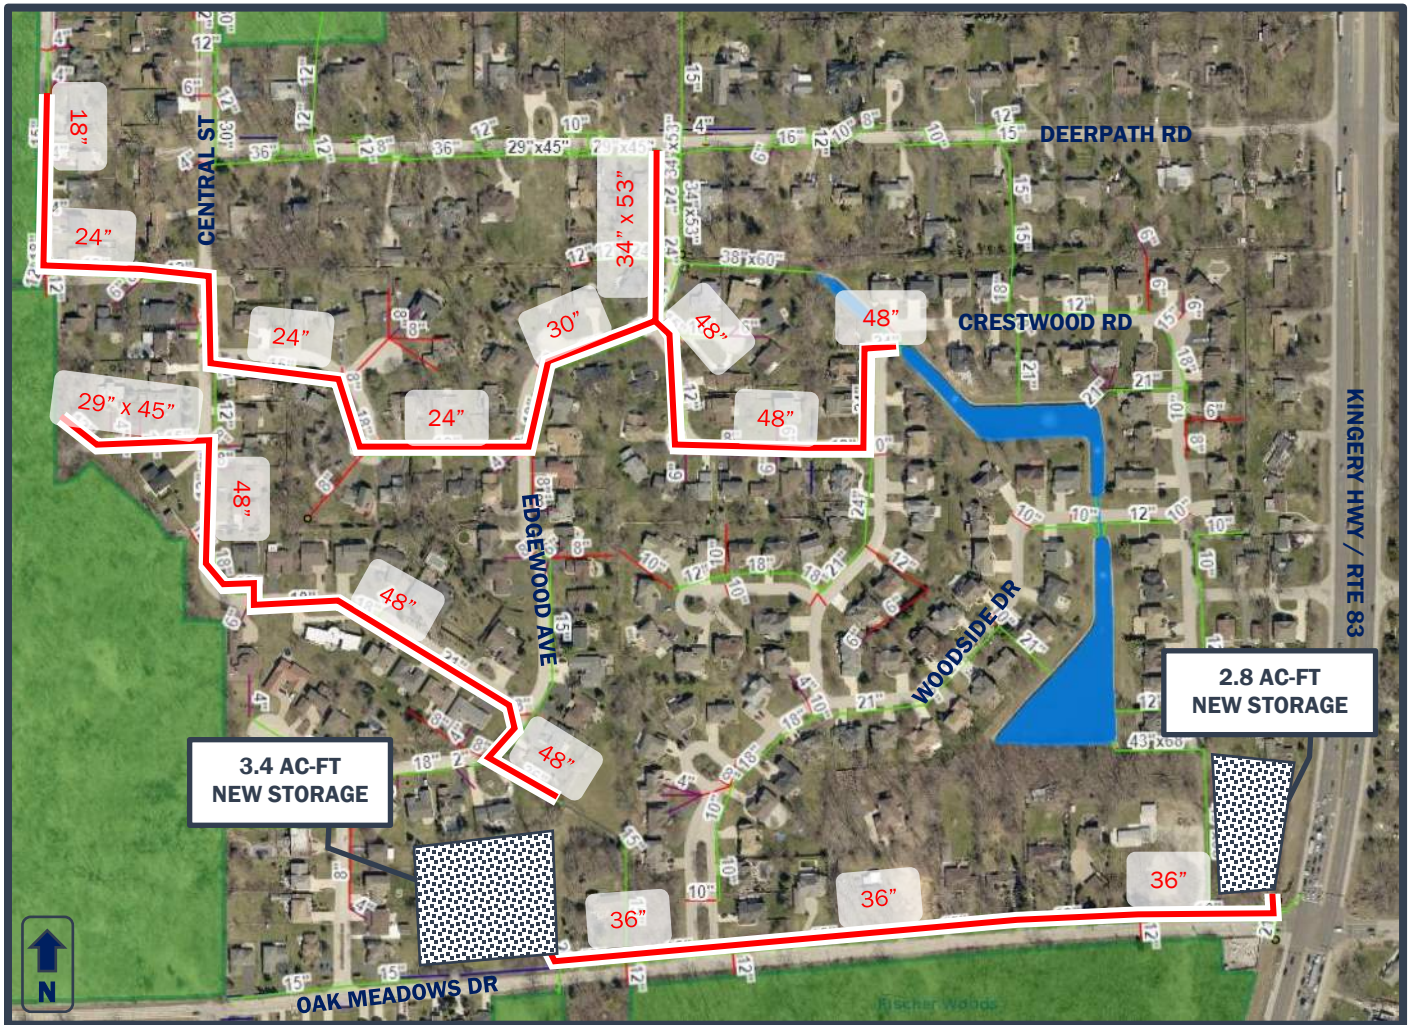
ALTERNATIVE B | Proposed storm sewer improvements in Area 2, 3 and 4
